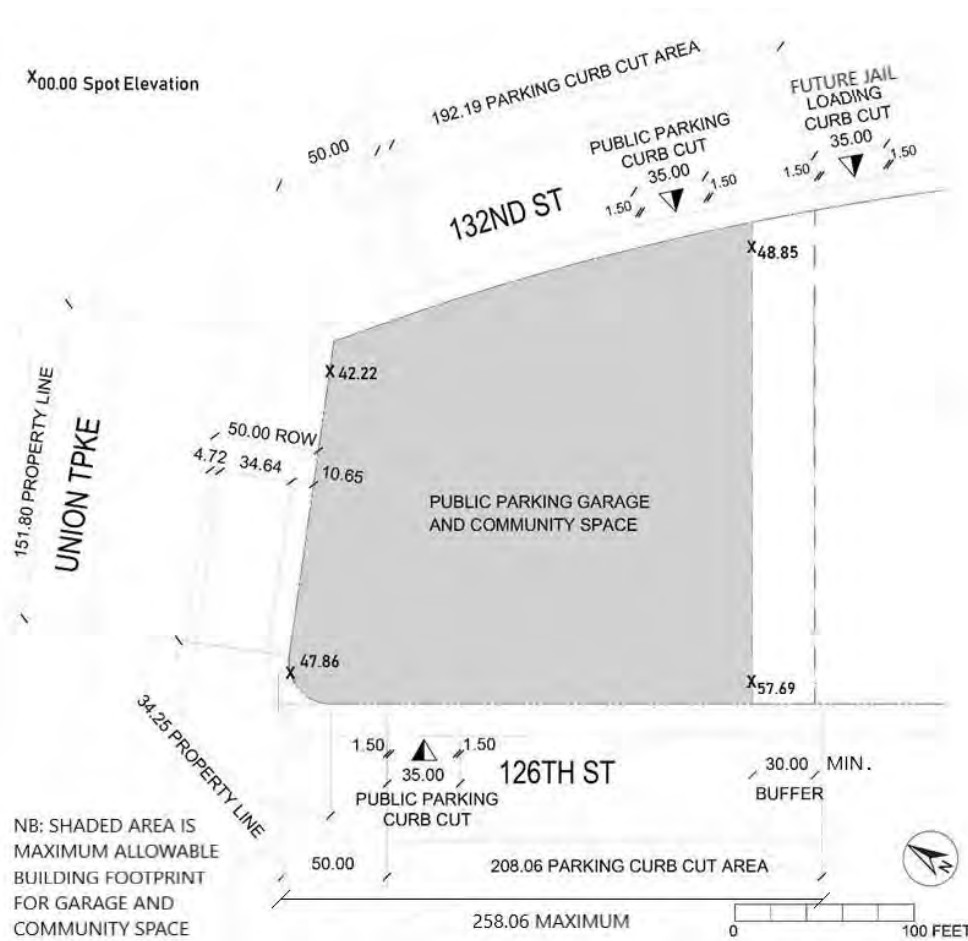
Project Site Plan – we want to edit this pic to clarify setback
